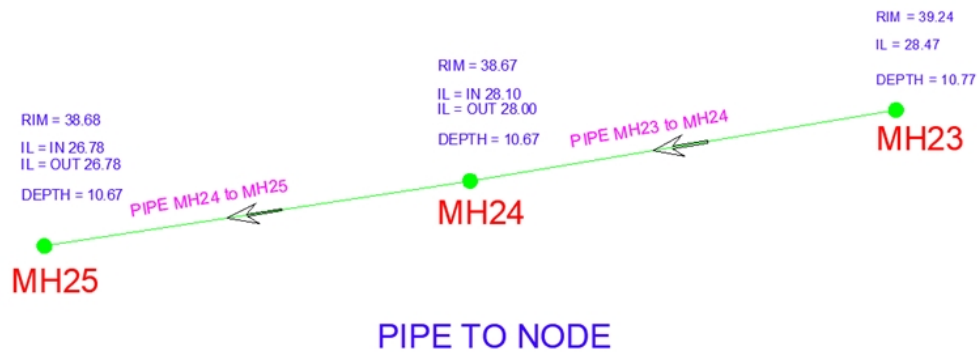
Sewer Pipe Cover and Invert Elevations simplified
